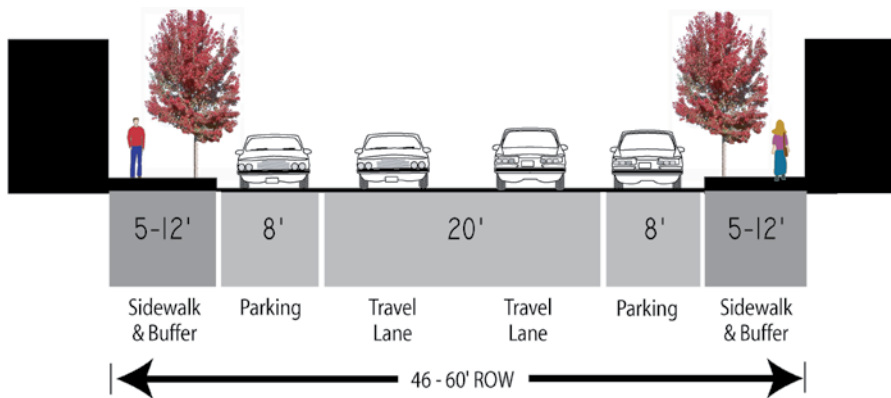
Proposed Minor Collector / Neighborhood Street / Local Street Cross Section
